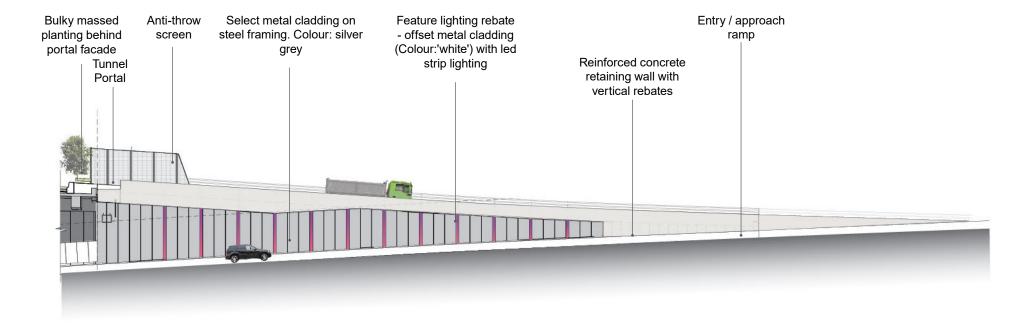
Iron Cove Link - Tunnel portal dive wall - south elevation
